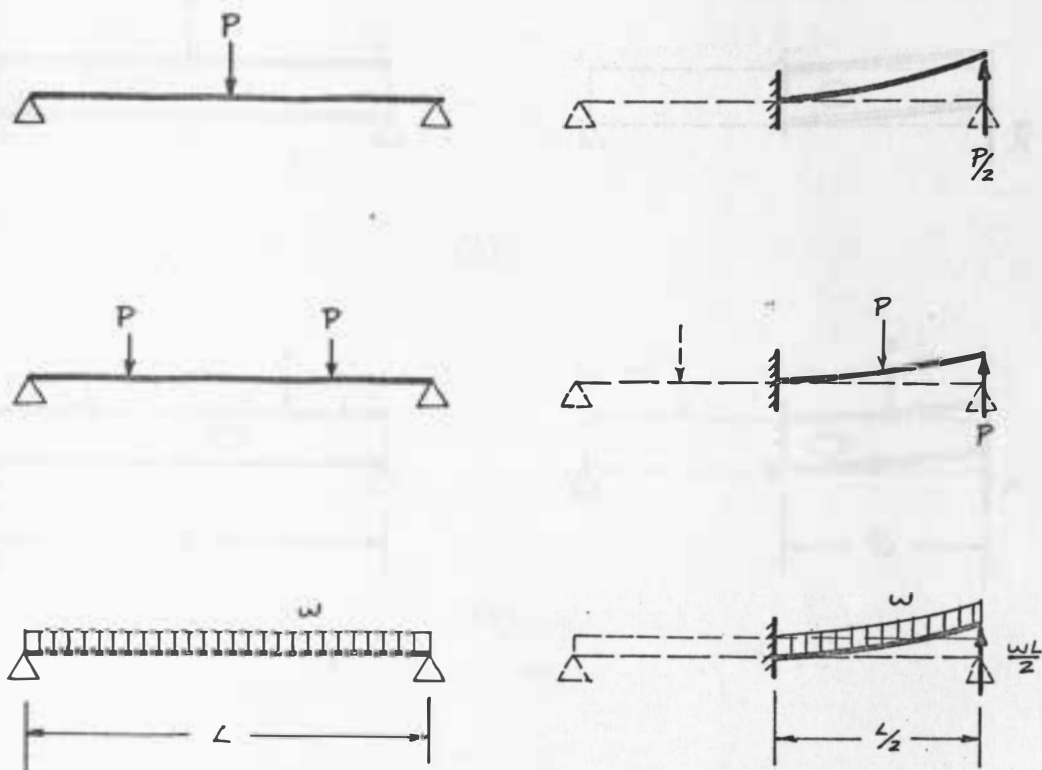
Correlation Between Simply Supported Beam and Cantilever Beam with Symmetrical Loading.
